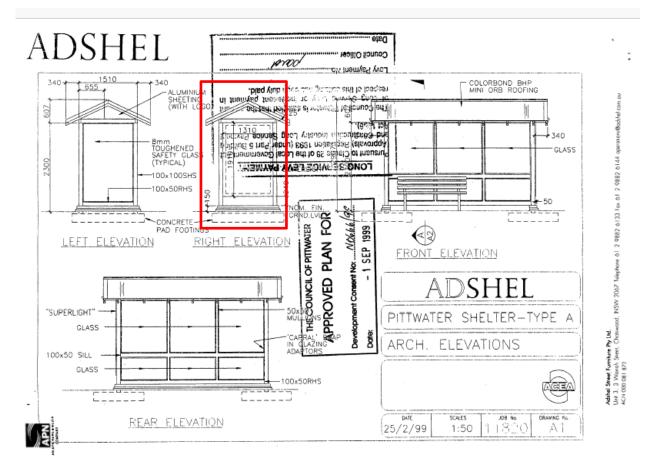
Shelter C4 DA0666/99 Stamped Elevations 1 of 2
